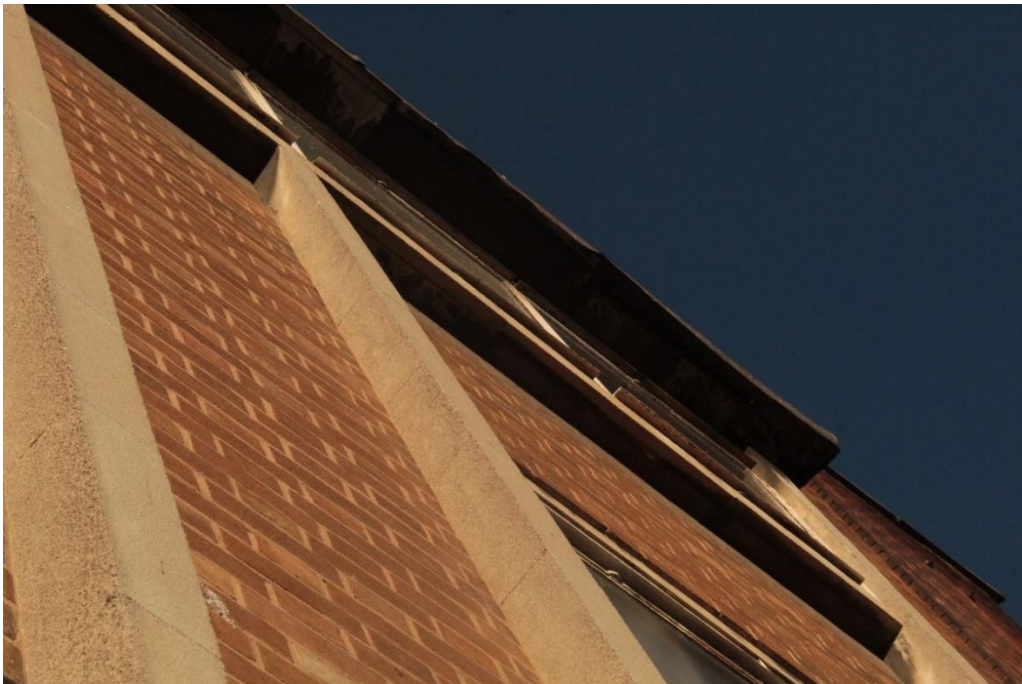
Cracks in two locations on the face of the vertical section of the concrete 'frame'. The cracking continues up both sides of the frame in both locations.
